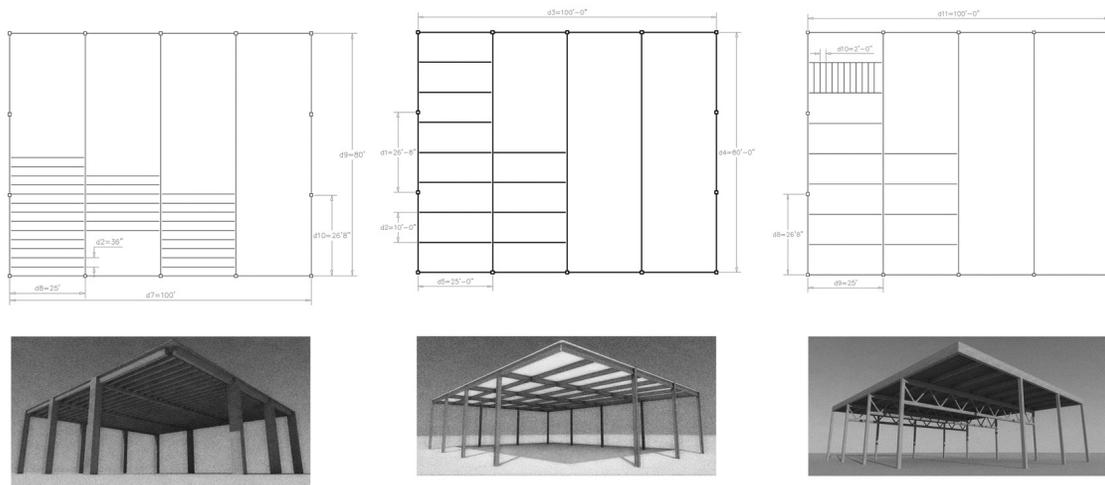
Three long span floor systems considered in this study (left to right): concrete joists and post-tensioned concrete beams, steel wide-flange beams and girders, wood joists, glue-laminated beams and trusses. A fourth long span, post-tensioned concrete slab and beams, is not shown but is identical to the layout of the other concrete system without the joists.
